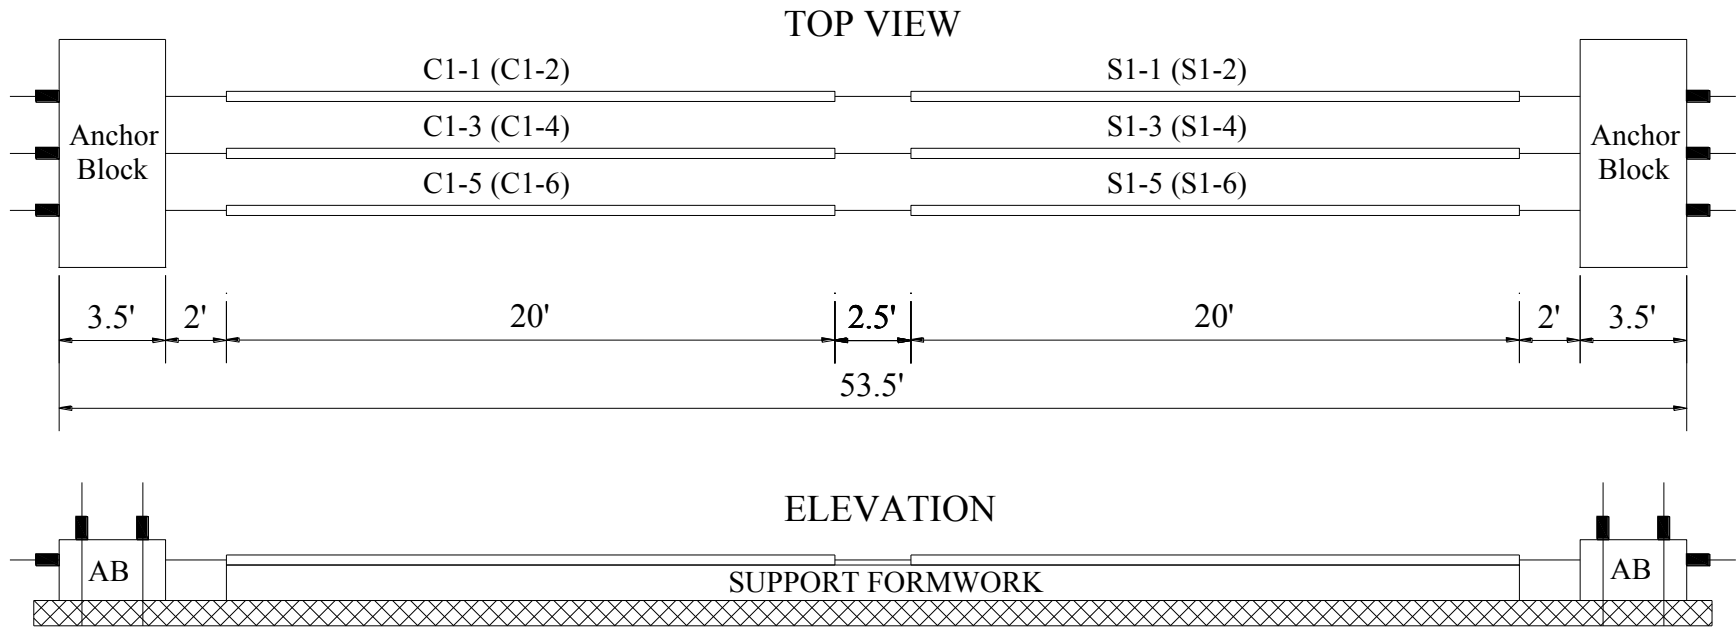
Form Work of Small Prestressing Concrete Beam Units
